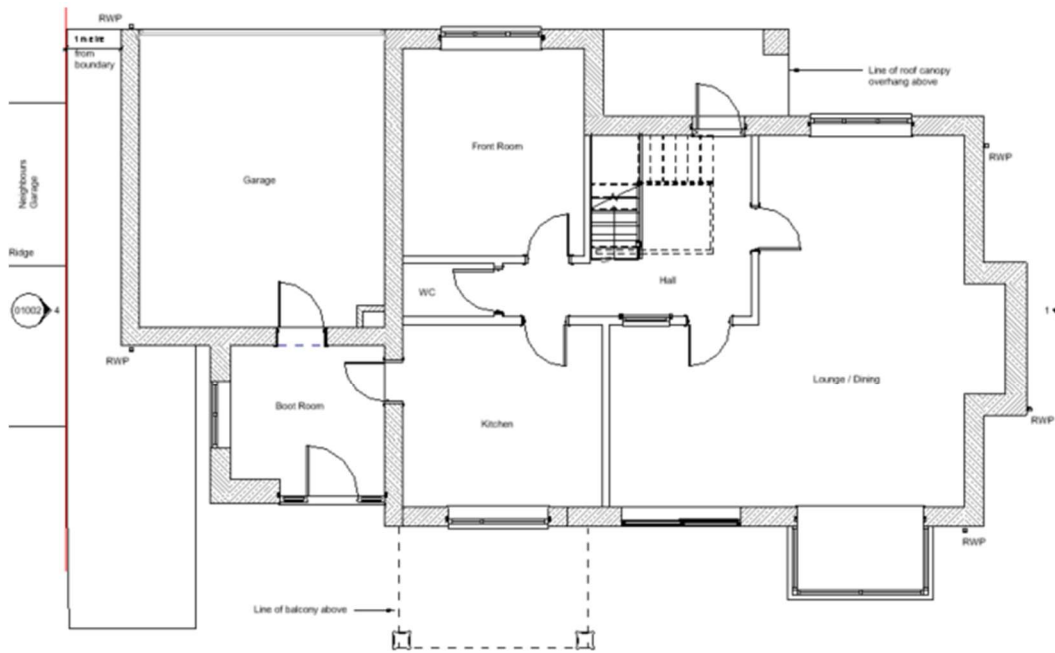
The Beeches Existing GF Plan (N.T.S.)
